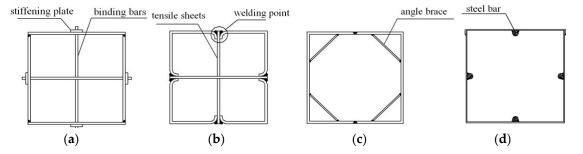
Comparison of existing stiffeners and steel-bar stiffeners. (a) Binding bar; (b) tensile sheet; (c) angle brace; (d) steel bar.
